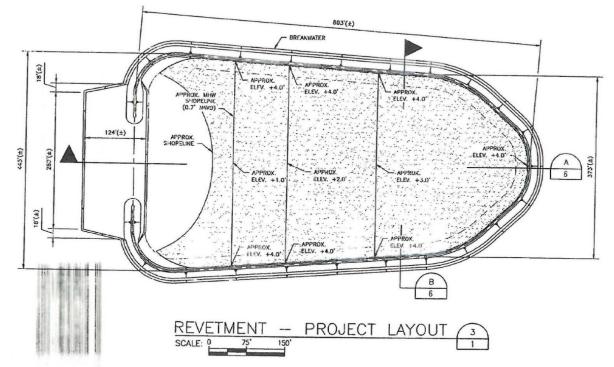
Schematic drawing of the proposed layout of the new rookery island (Figure 2 in the Biological Evaluation Form for the San Antonio Bay Bird Island Restoration Project)
